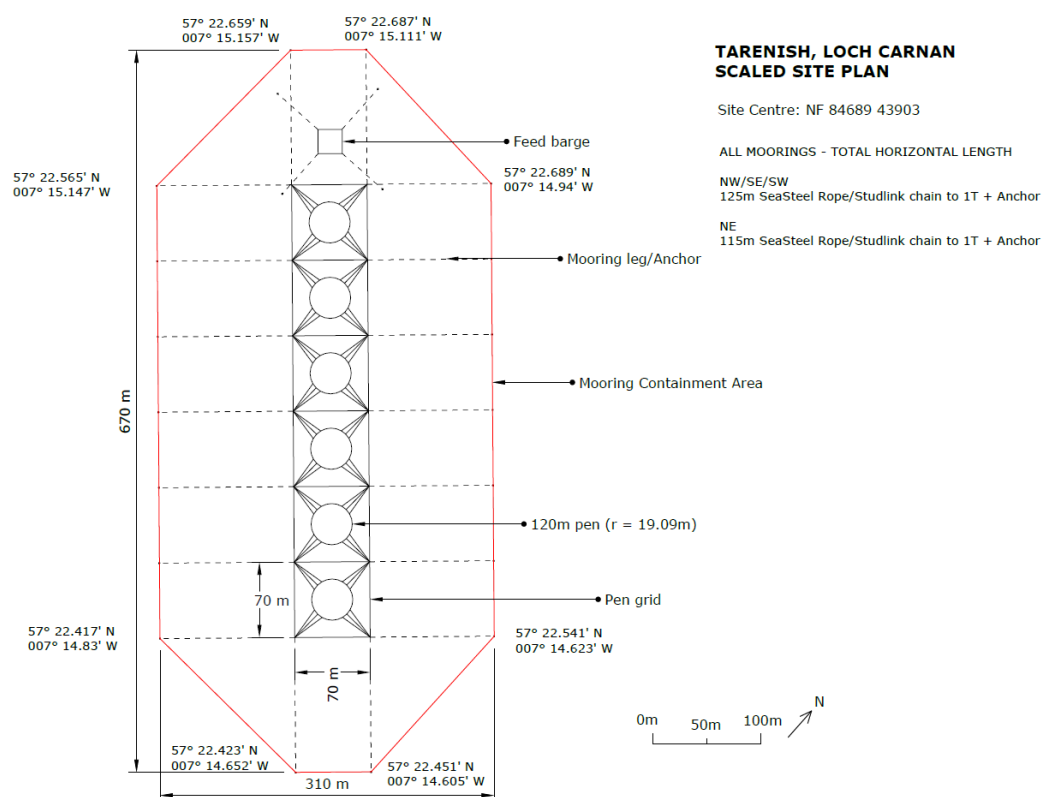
Scale site plan (Original scale drawing in Appendix 4).
